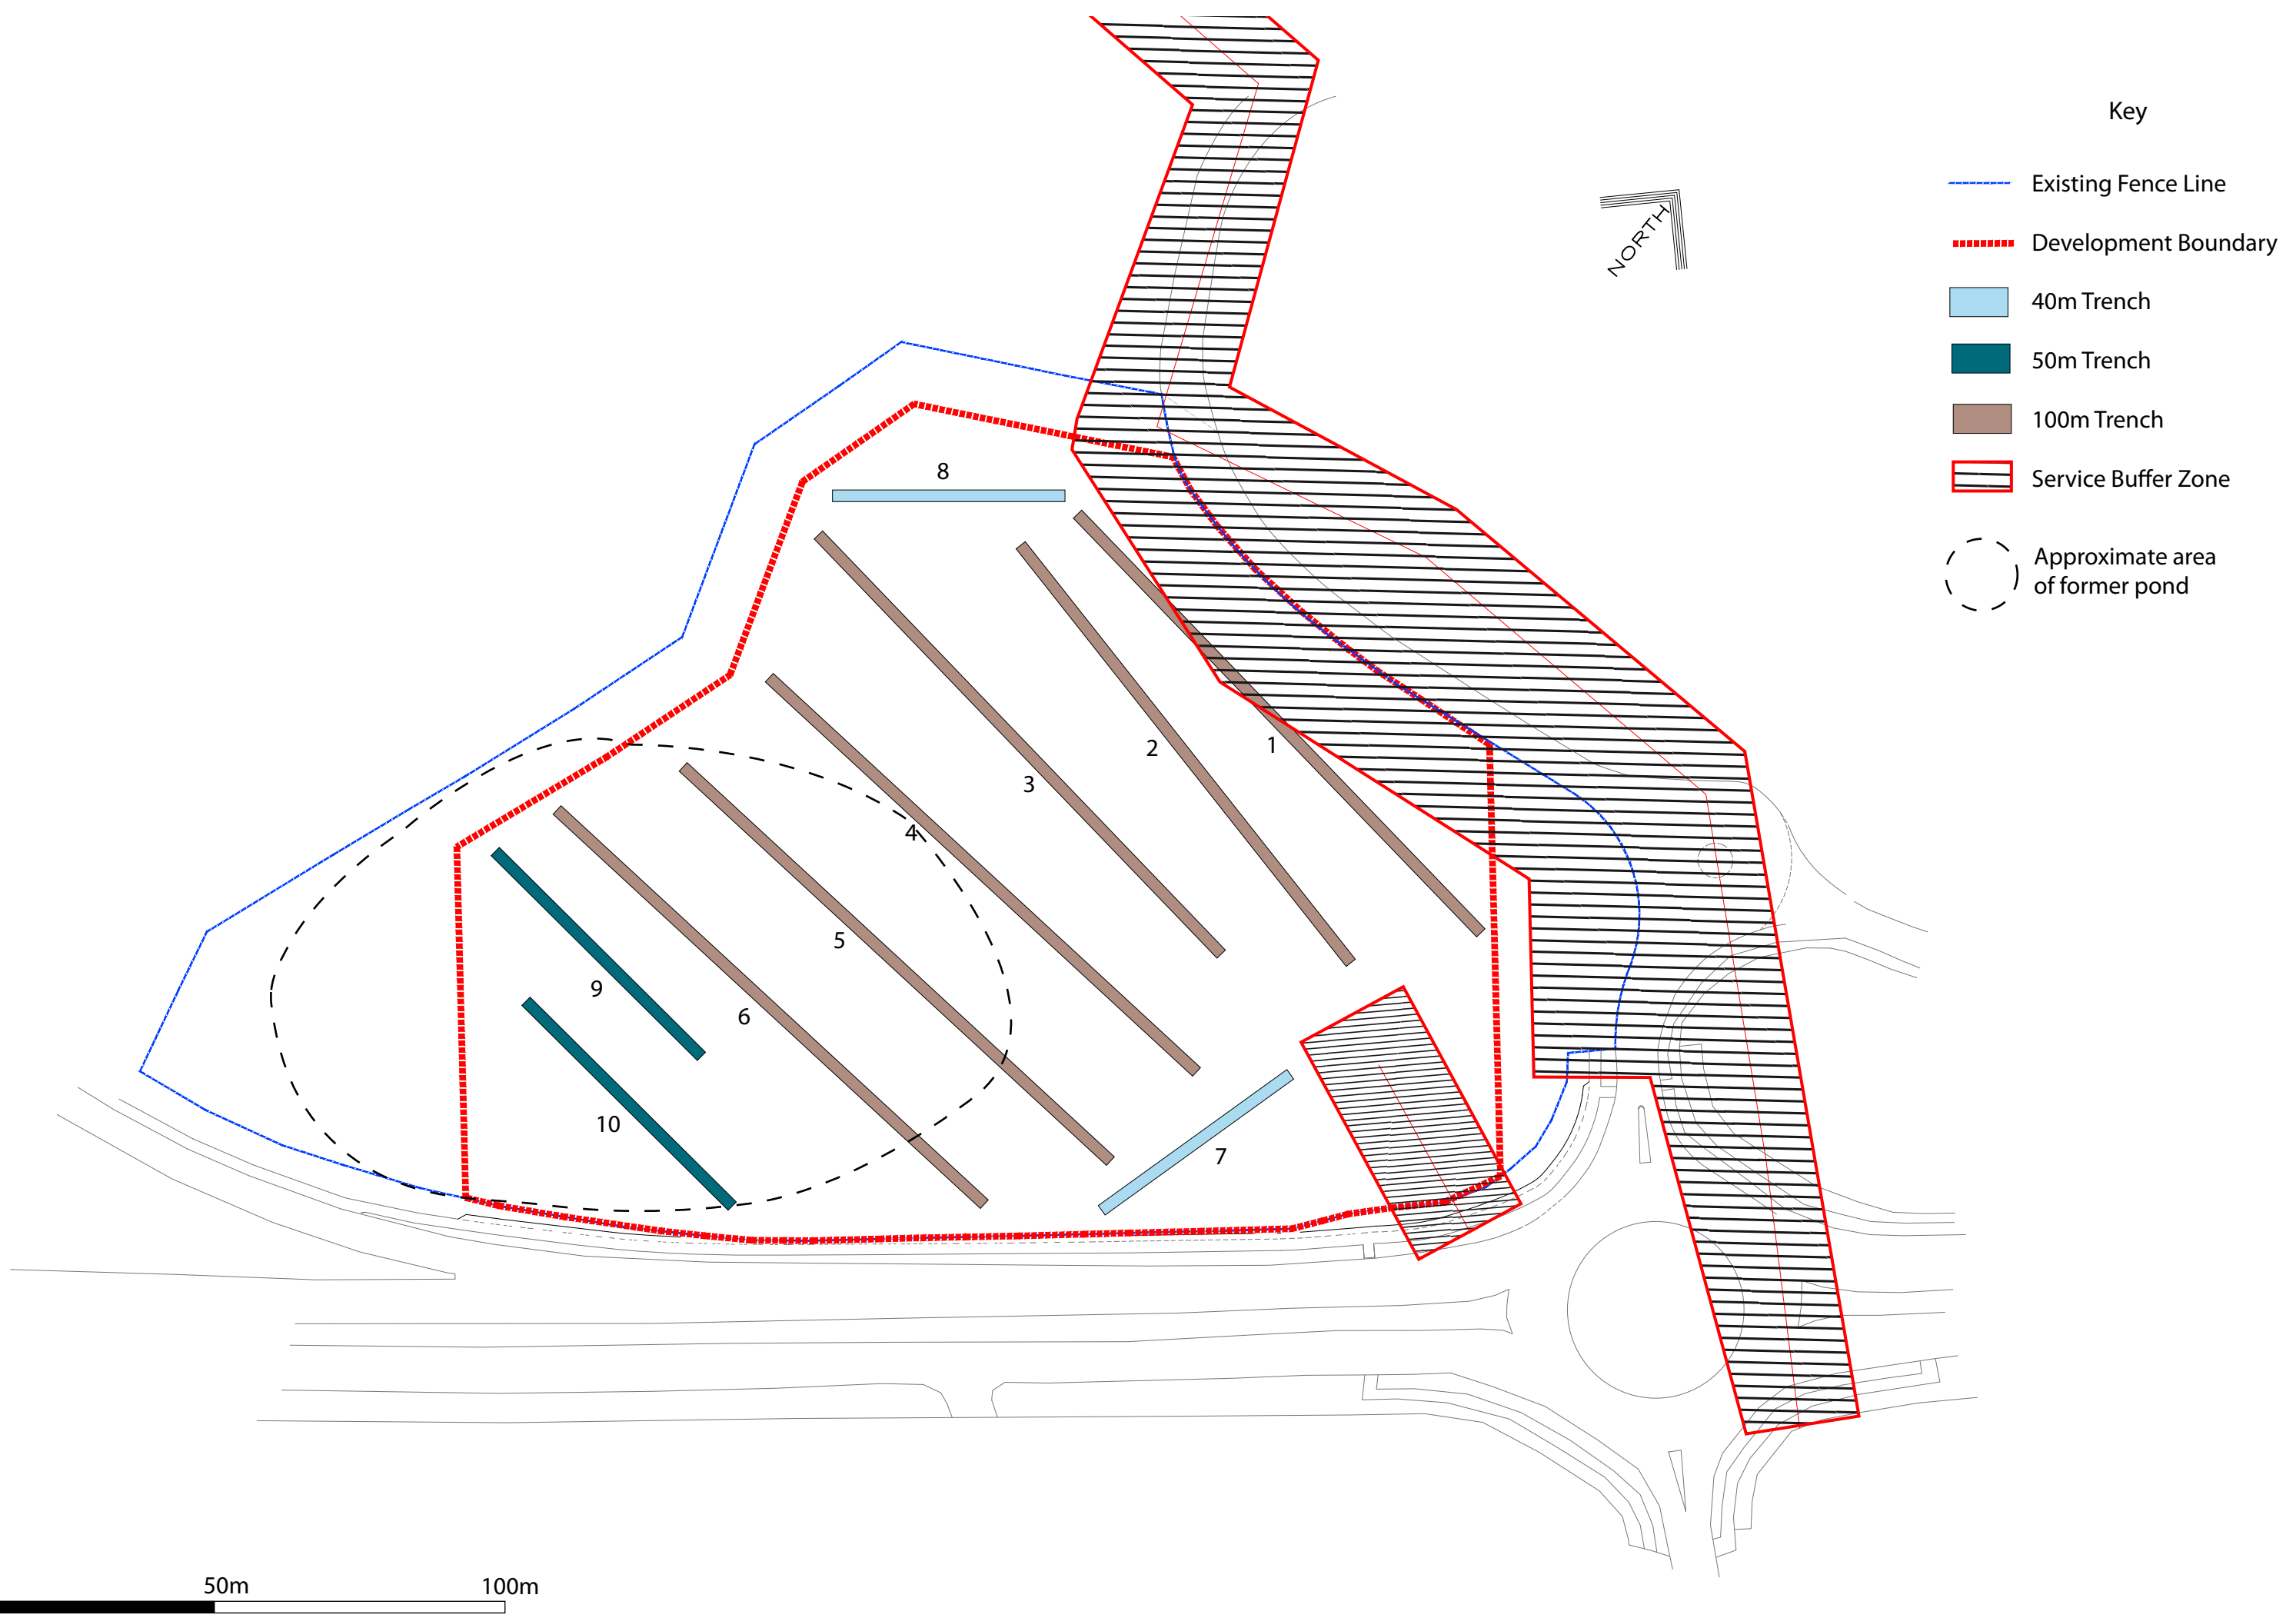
Evaluation Trench Layout at Inchwood Business Park, Bathgate
